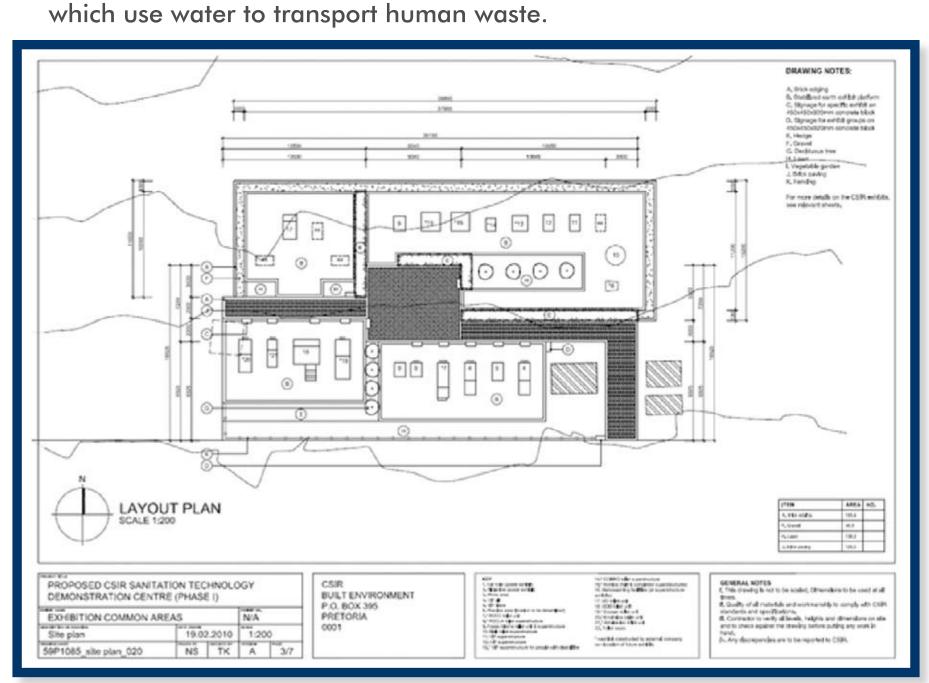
Layout plan of the Sanitation Technology Demonstration Centre
